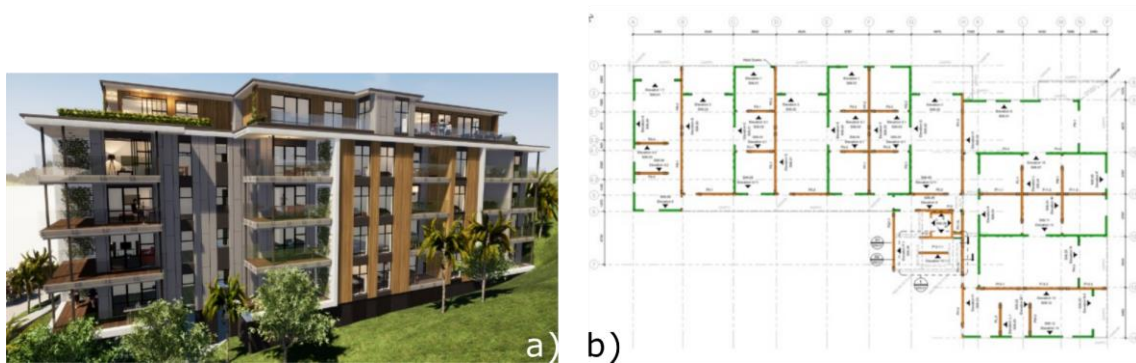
a) Architectural concept of Haven Road Apartments, b) Floor Plan with CLT shear walls in Orange and CLT loadbearing walls in Green.
